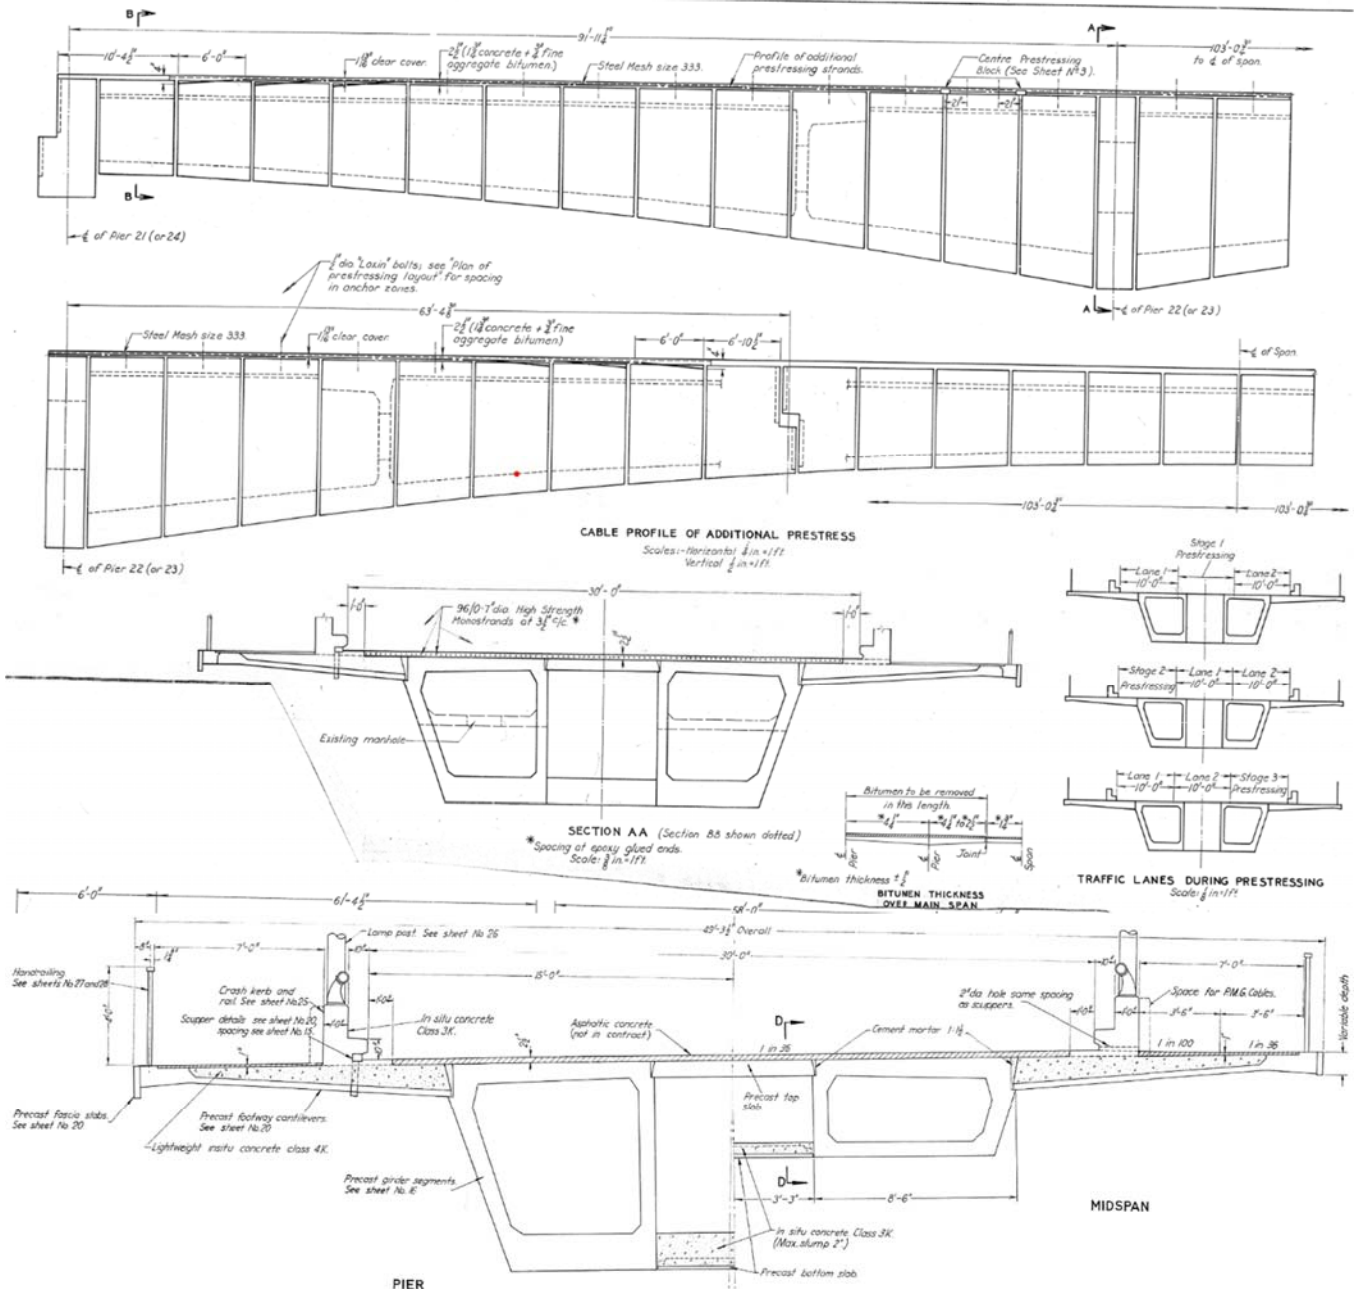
Three cell varying depth box girder of spans 21-24 [6]
